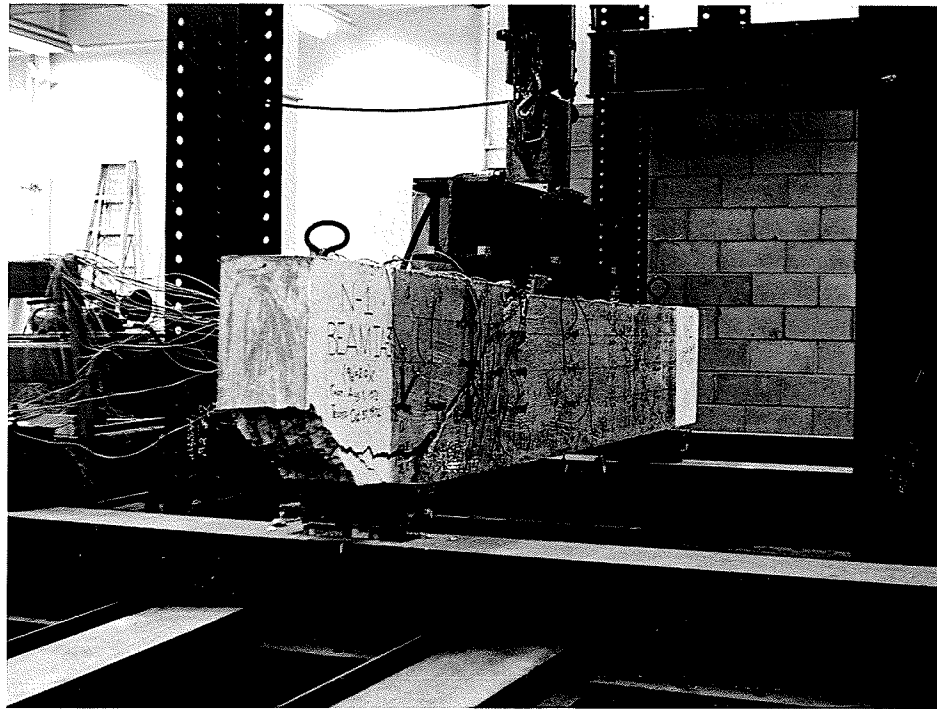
BEAM IA-3 SHOWING FINAL FAILURE
